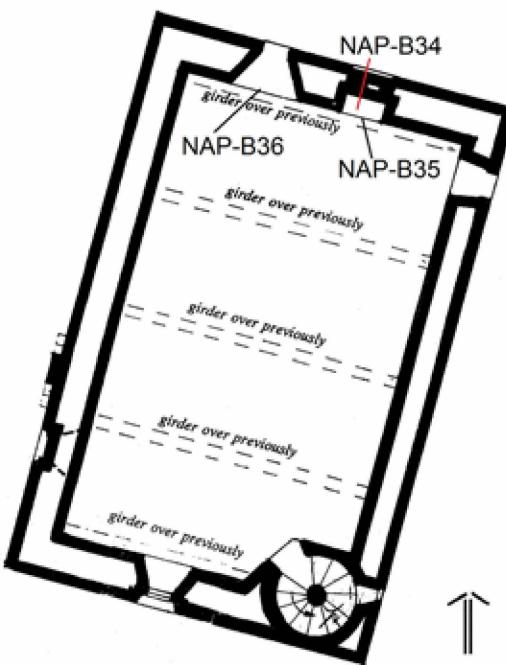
High-end tower, second-floor plan showing the location of samples NAP-B34–6 (John Warren)
